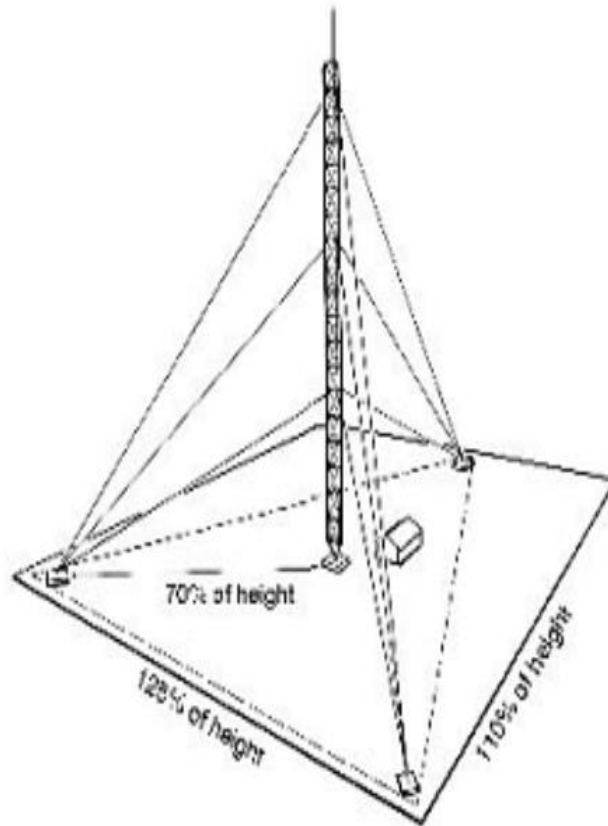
Guyed tower (Source: Etisalat Tower Specification, 2012)
